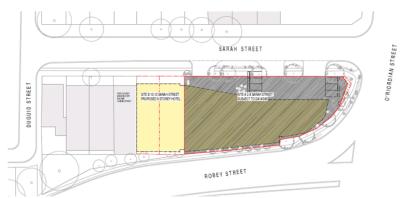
Proposed Site Plan (showing 2-8 Sarah Street hatched in grey)
